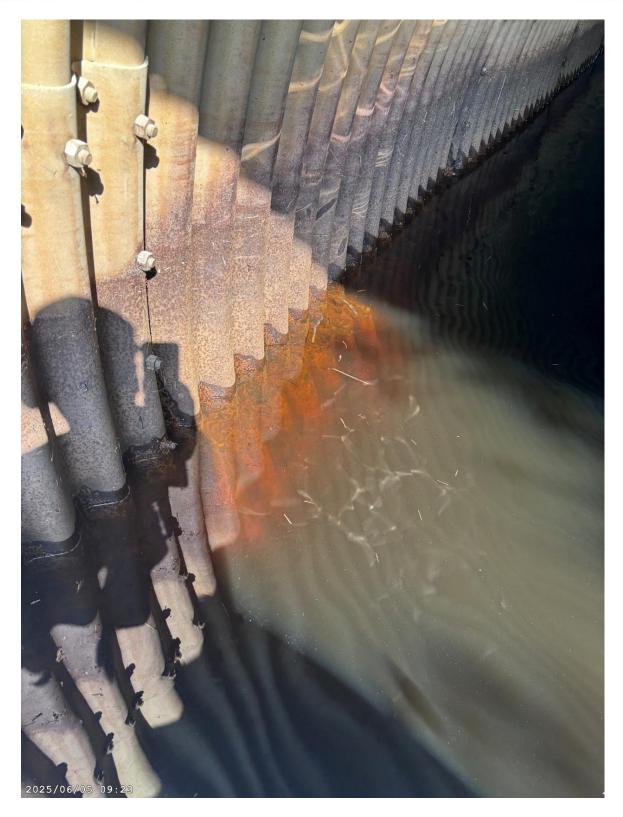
Corrosion of culvert barrel above/below water line
